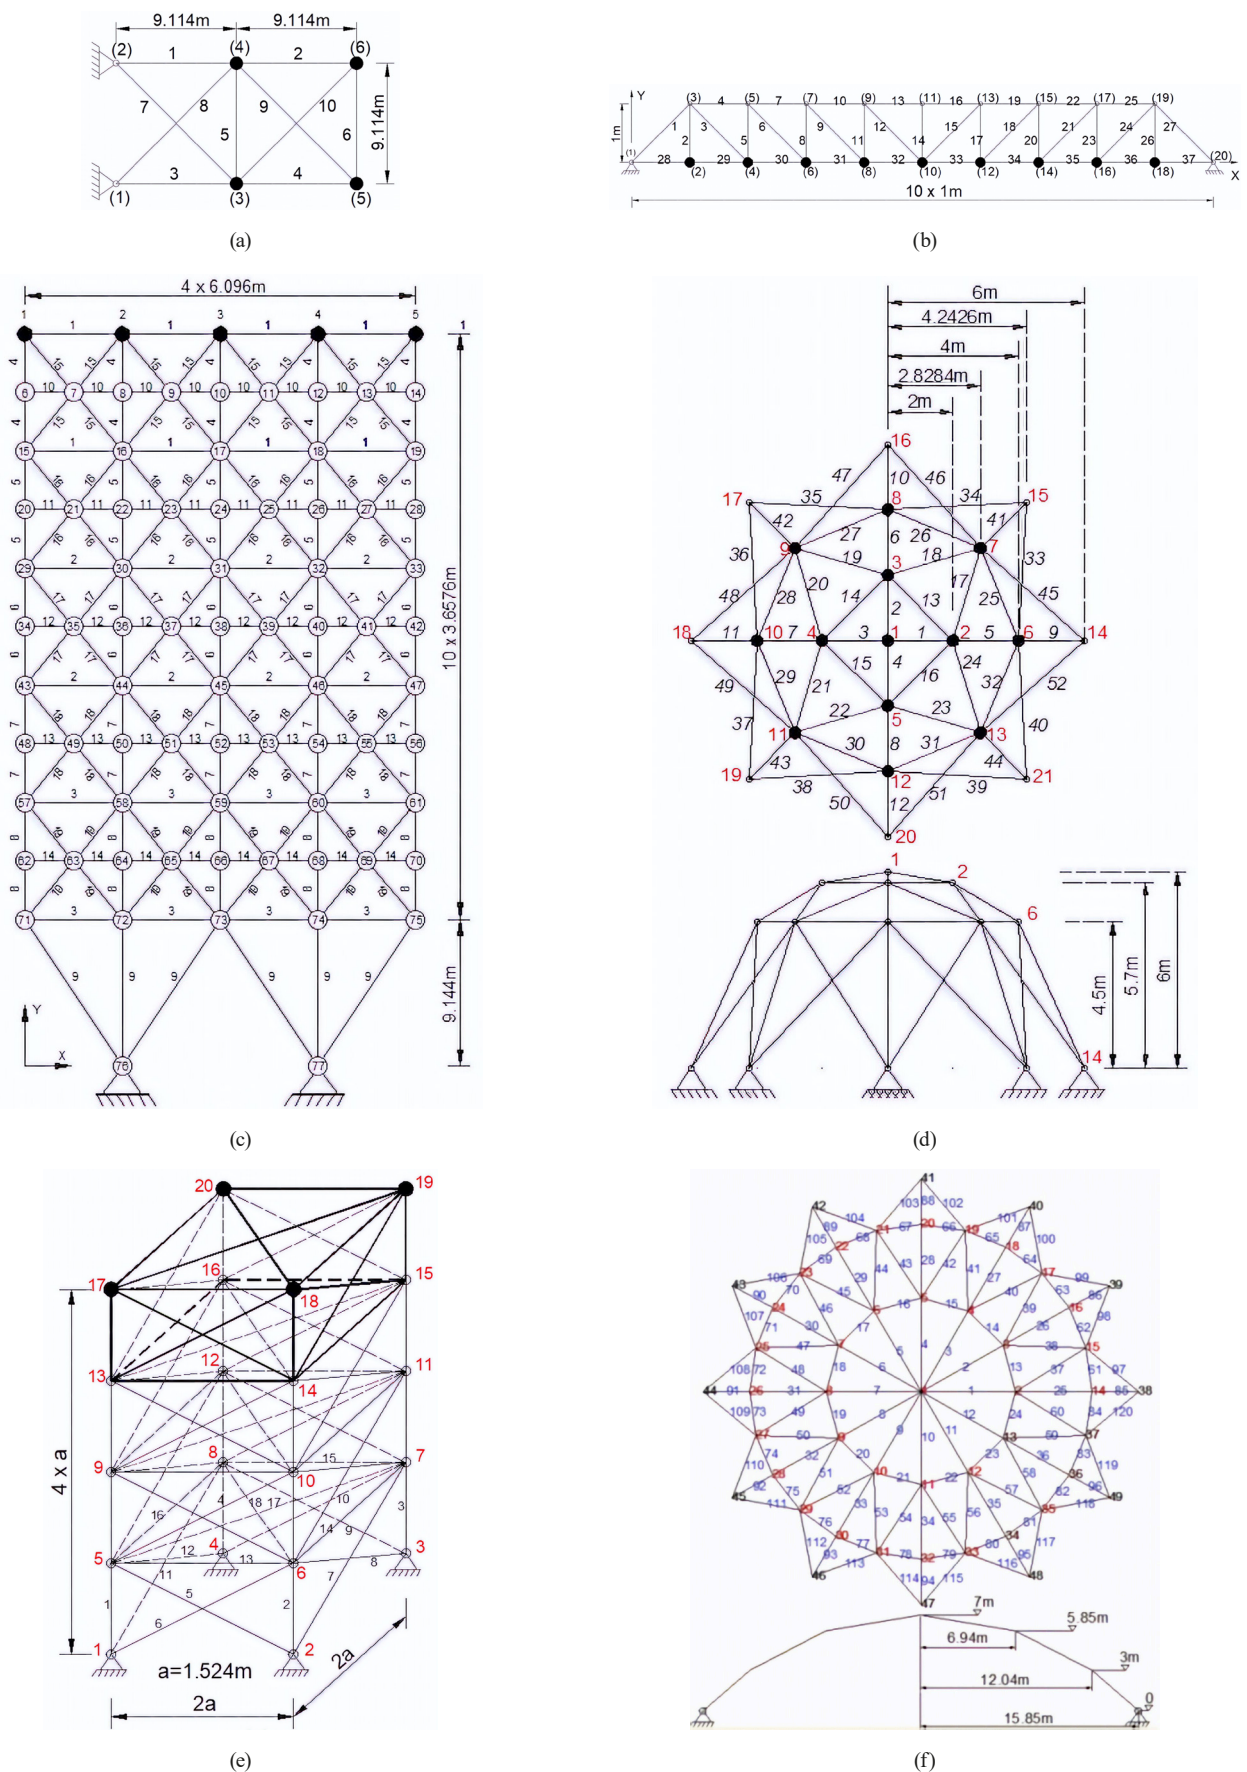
Truss optimization problems, from [20]: (a) planar 10-bar truss, (b) planar 37-bar truss, (c) planar 200-bar truss, (d) spatial 52-bar truss, (e) spatial 72-bar truss, (f) spatial 120-bar truss
